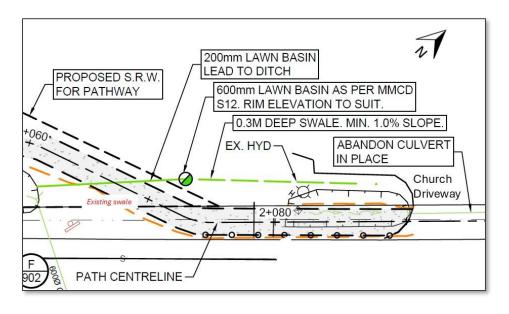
Site Proposed Project scope adjacent to the Courtenay Fellowship Baptist Church property including pathway construction in an existing swale
